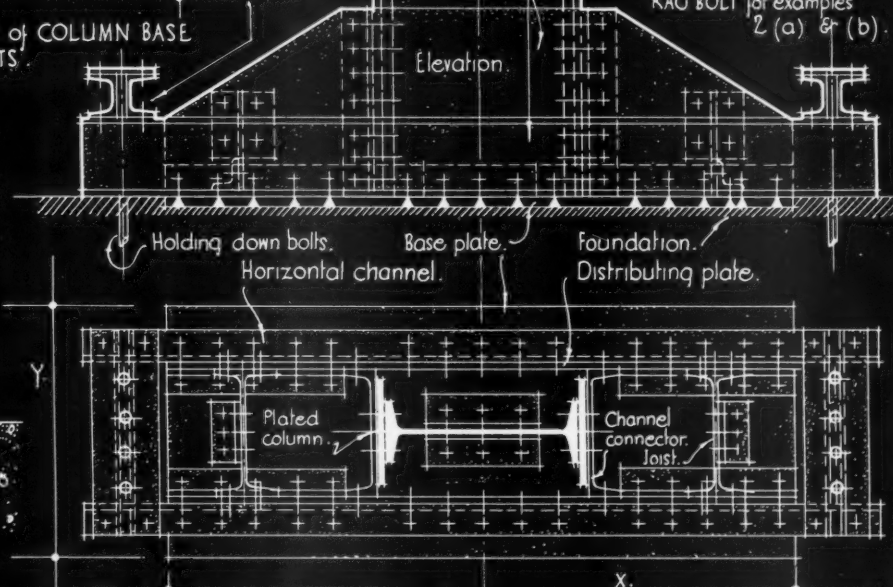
TYPICAL EXAMPLE OF HEAVY COLUMN BASE TO TAKE LARGE BENDING MOMENTS.
